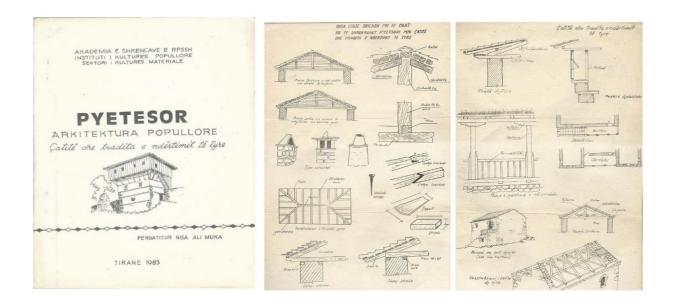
The Muka's questionnaire titled "Roofs and their building tradition" (Çatitë dhe tradita e ndërtimit të tyre) and its graphic annexes (Source: Muka, 1983).
